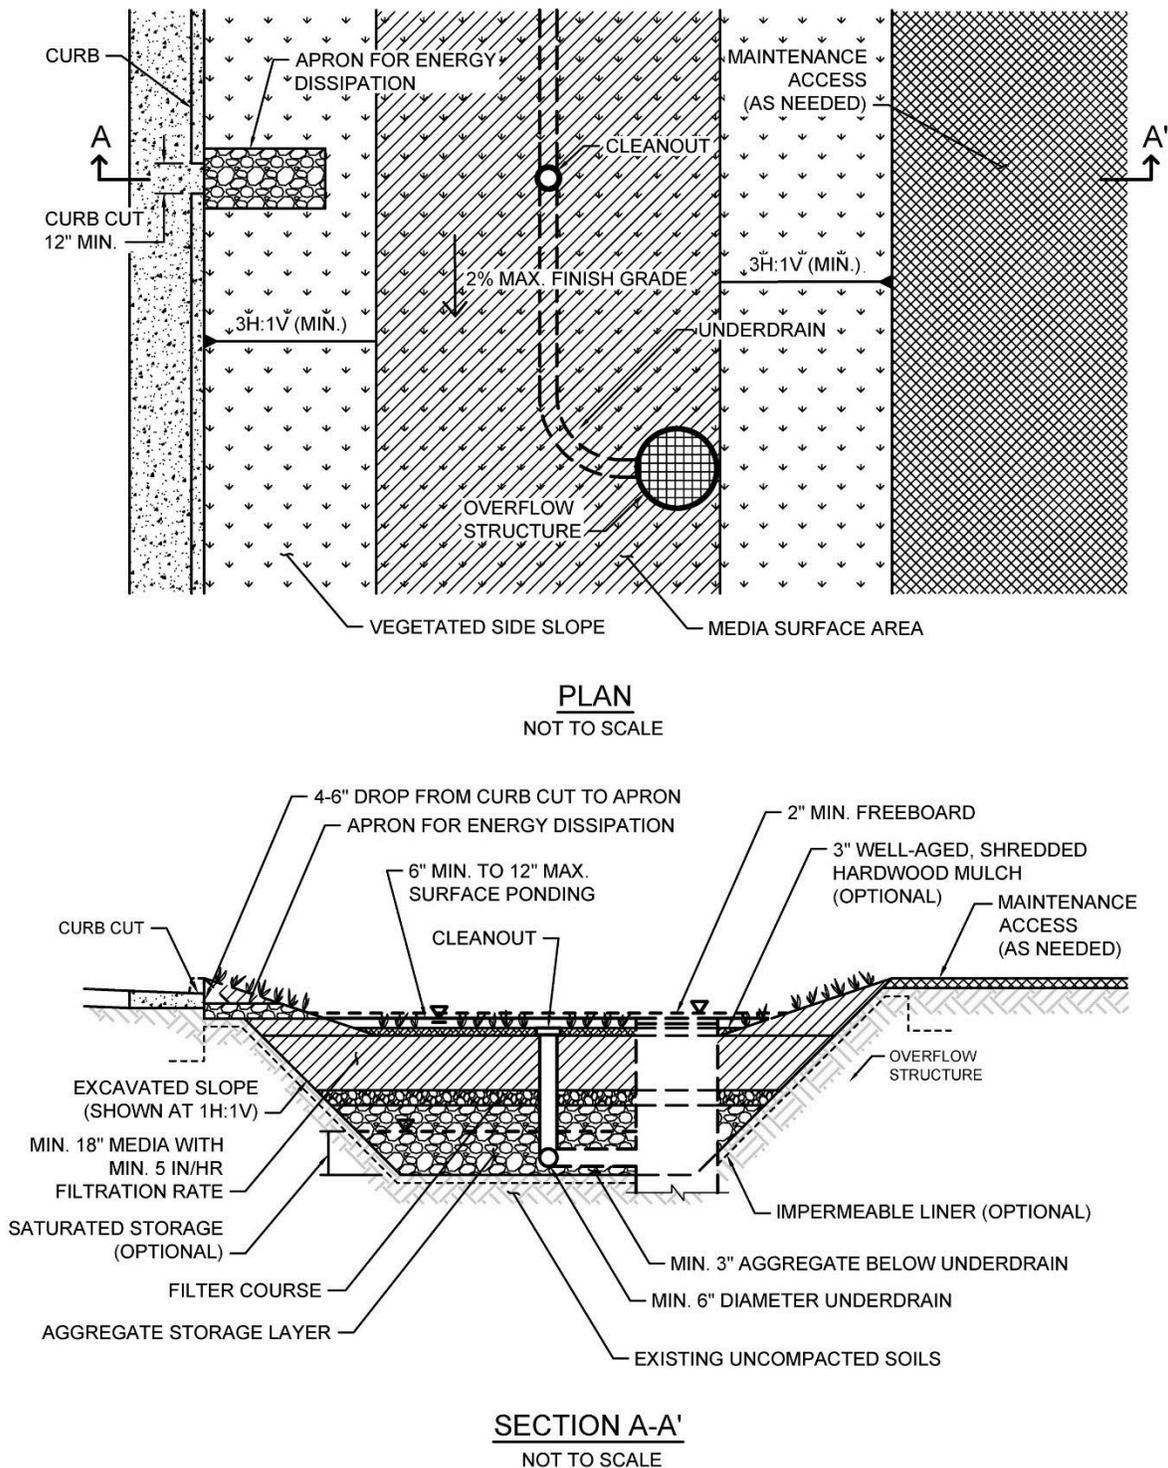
E.13-1: Typical plan and Section view of a Biofiltration BMP
